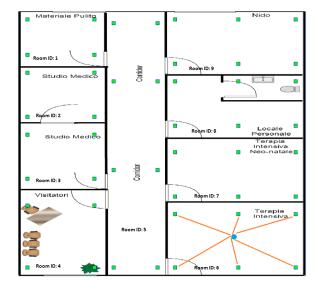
Hospital Floor plan with the deployed anchor nodes
